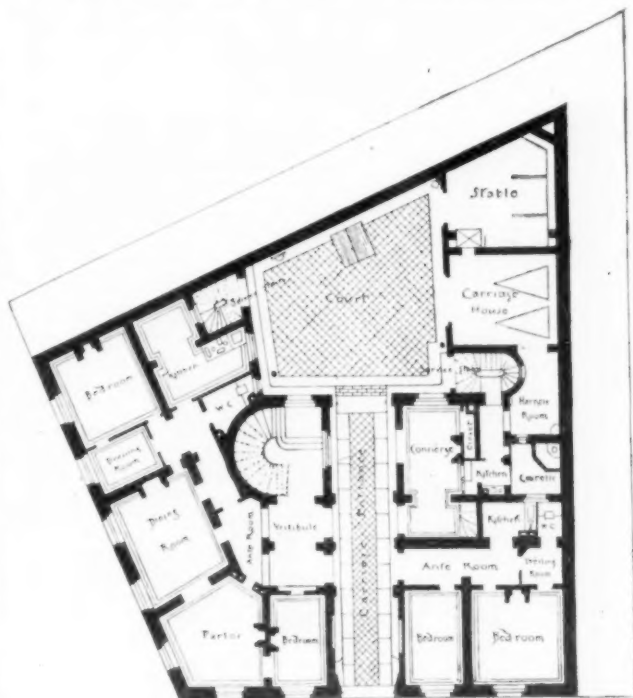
Apartment-house with Carriage Entrance and Court. M. Vaudremer, Architect. Plan of Ground Floor: After *L'Encyclopédie d'Architecture*.
